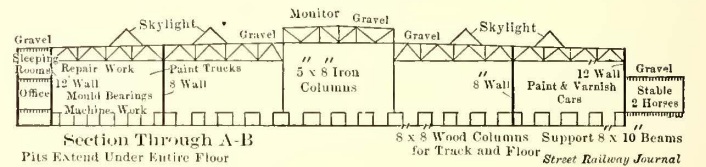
SECTION OF CAR HOUSE NOT APPROVED, BECAUSE OF INCOMPLETE CUT-OFF WALLS
